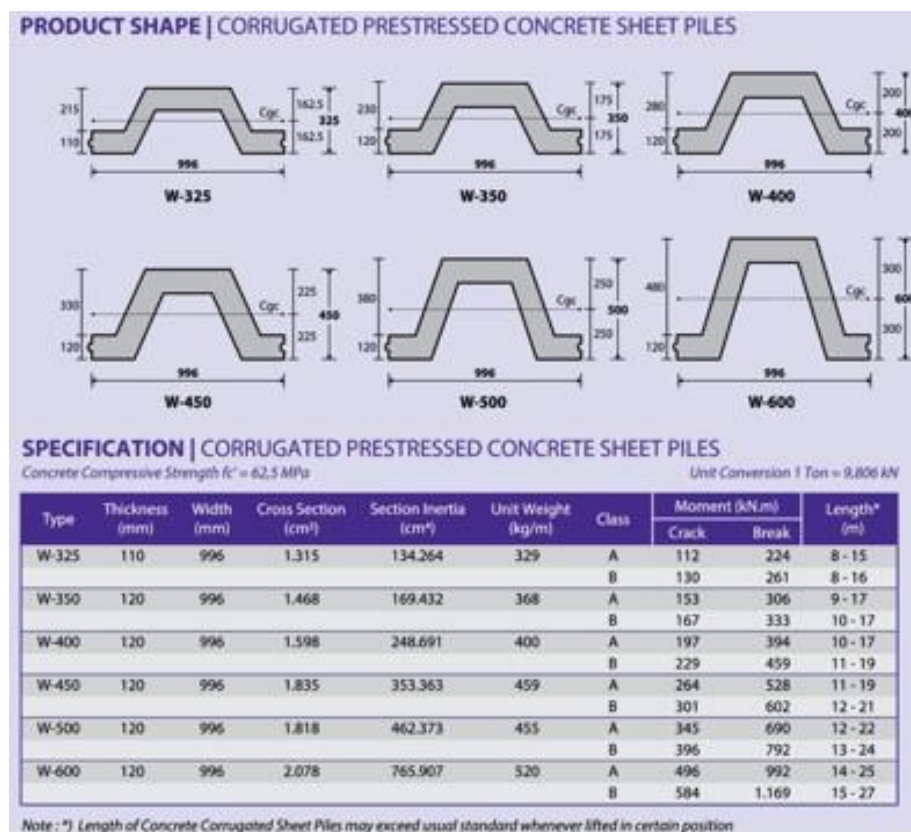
Typical datasheets of Corrugated Concrete Sheet Piles
